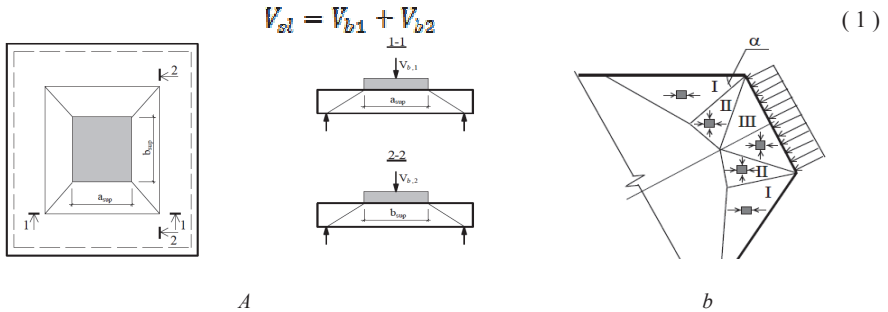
Model of a slab in form of perpendicular beams (a) and strained state of concrete in compressed zone (b).
